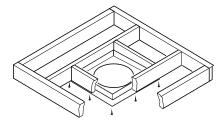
Firestop Spacer with Living Space Above Ceiling
